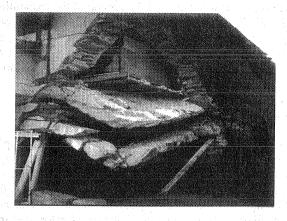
The damage in a solid block building which do not have proper joint walls in İzmit
